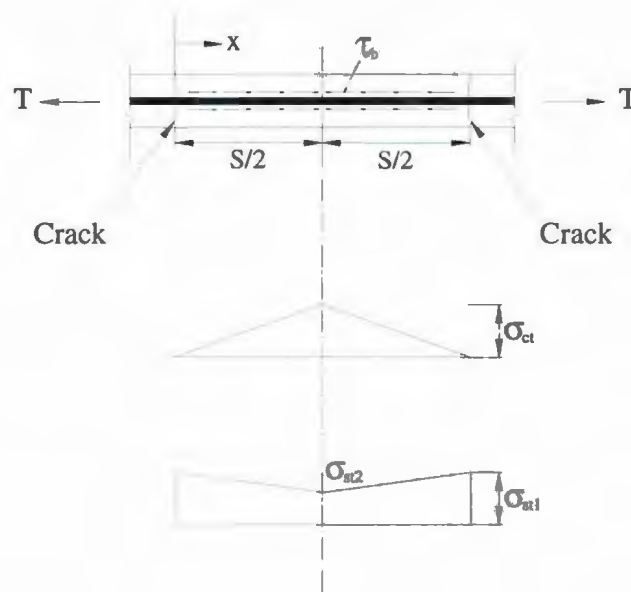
Cracked section, concrete and steel stresses after cracking
